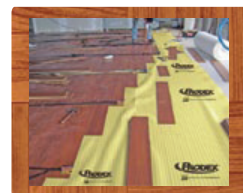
DETAIL OF A PRE-TENSIONED COMPOSITE FLOOR WITH PRODEX® UNDERFLOOR
